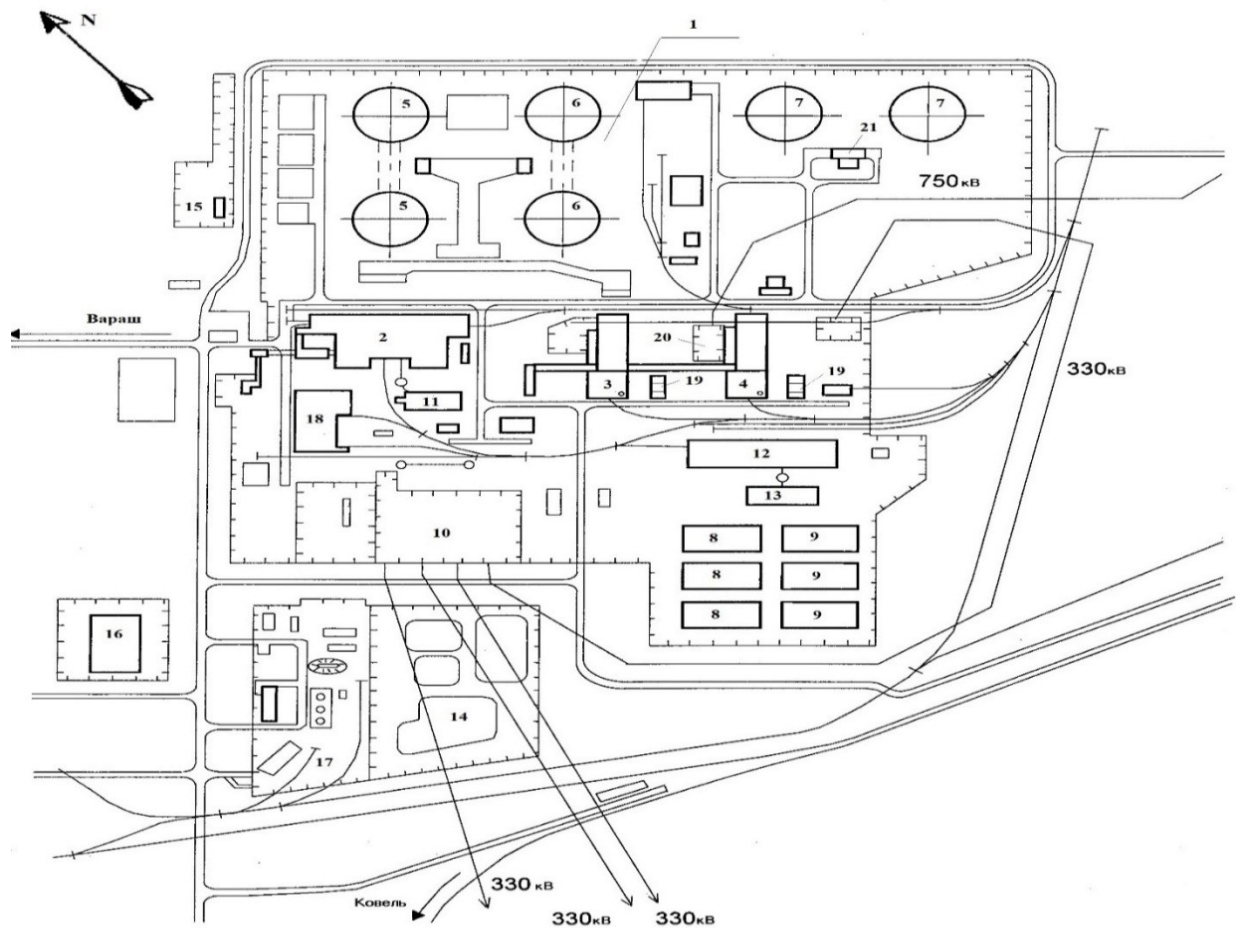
Schematic layout of buildings and structures at the SS Rivne NPP industrial site
